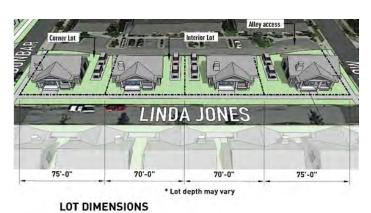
Single-family homes in Site C4 along Linda Jones Street
